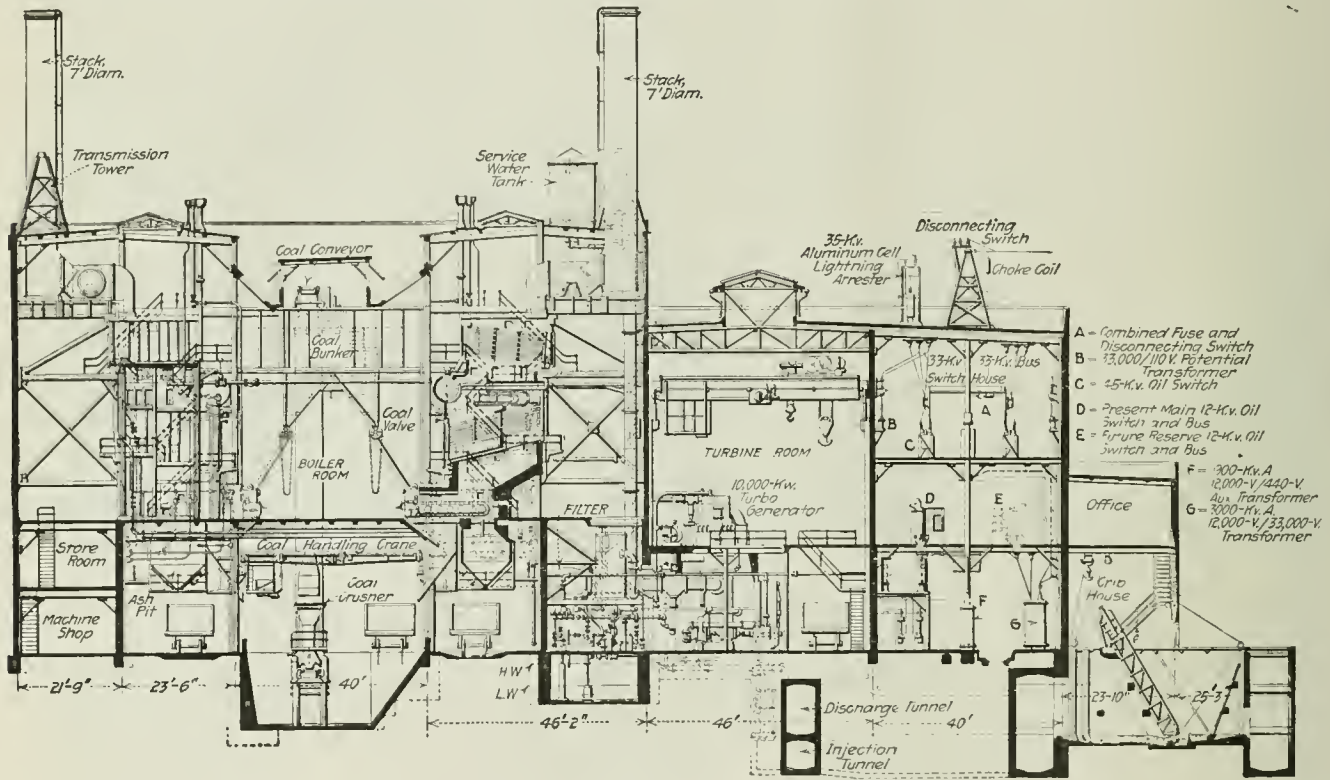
SECTIONAL ELEVATION THROUGH PLANT
